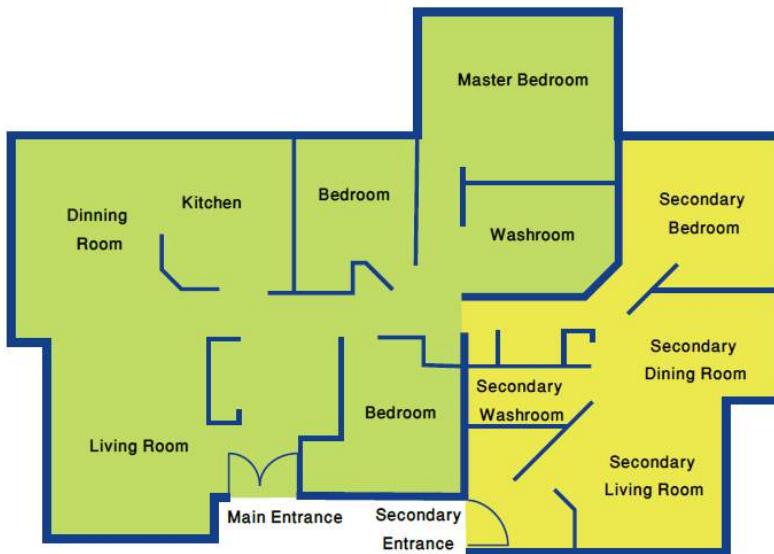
Examples of house plan for a MGH, with two distinct entrances to the premise (Multigenerational House Plans 2011)
